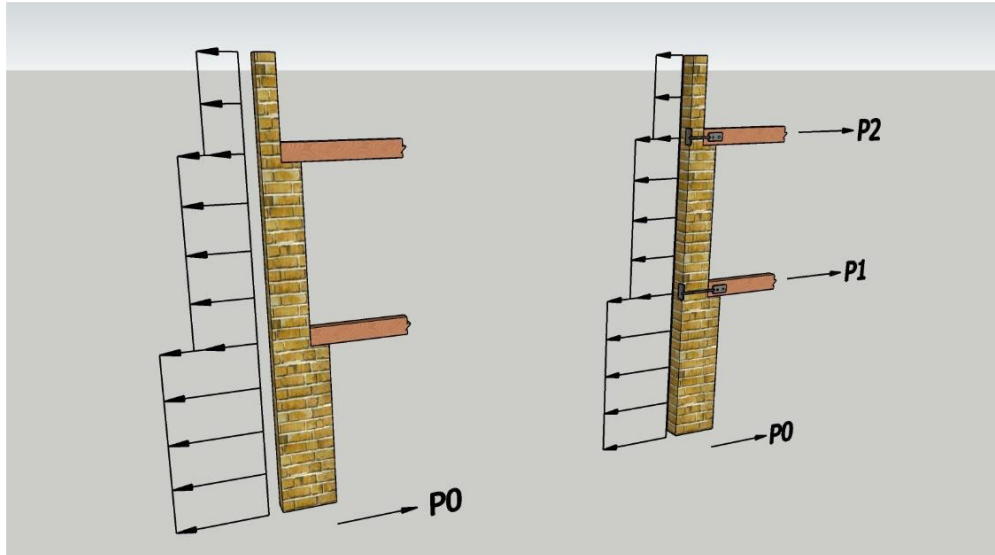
Behaviour of URM Walls Without Connections (left) and With Connections (right) (Abdul Karim, 2012)
